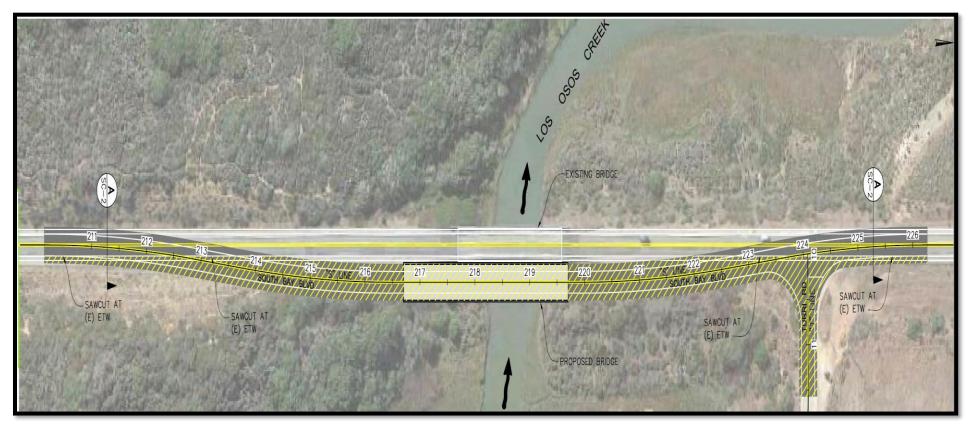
Plan view of proposed bridge and realigned approach lanes
